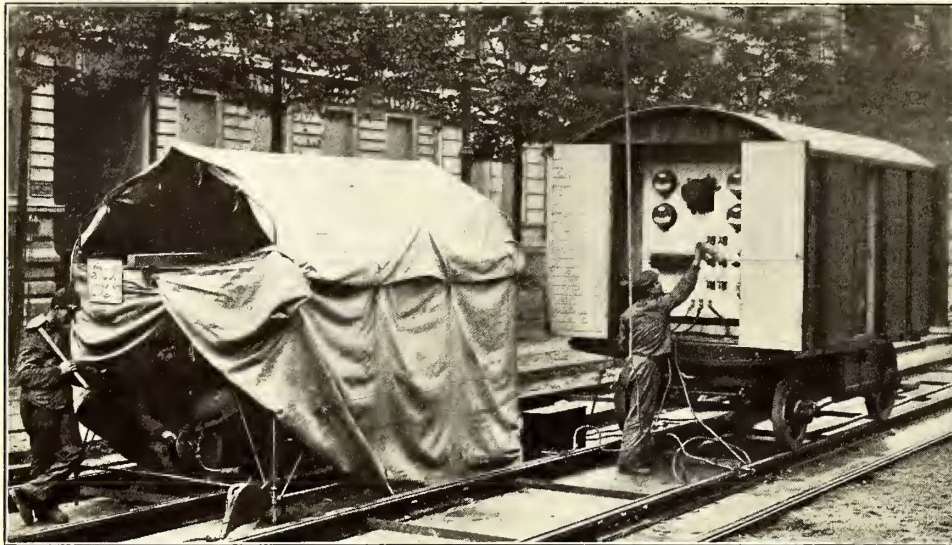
Berlin Rail Welding—Motor-Generator and Tent Outfit
